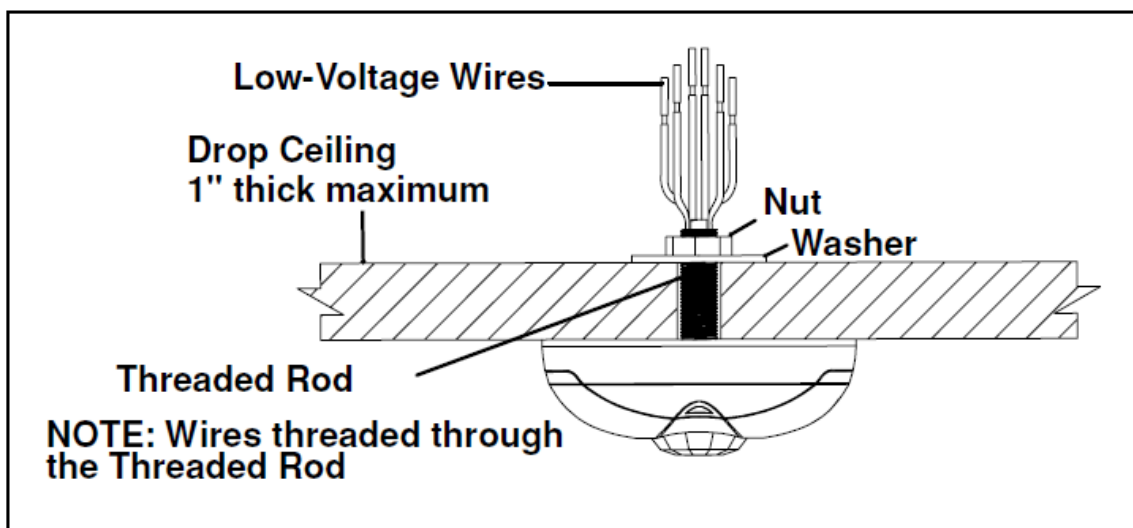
MC-C CEILING MOUNT INSTALLATION
